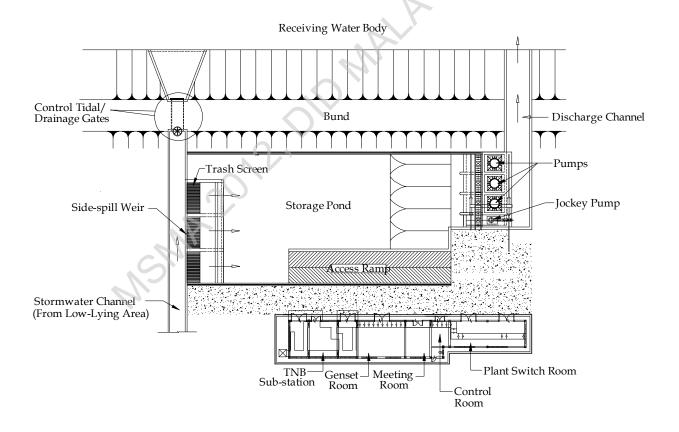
Typical Layout and System Components of Gates and Pump Station
